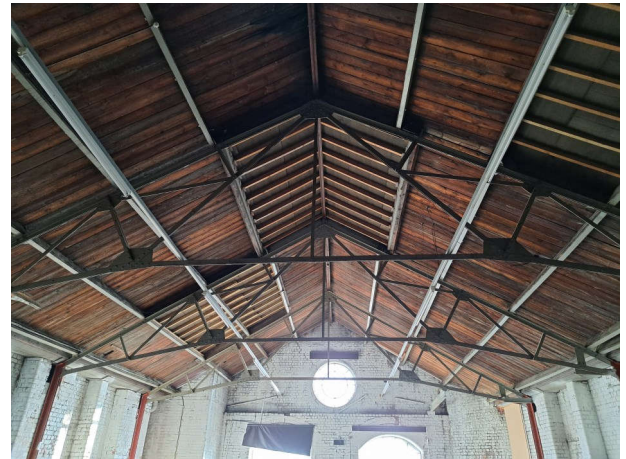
Detail of the roof structure of Building 1 (room FIF. 1). Note the blocked holes showing the former location of roof lights. No scale
